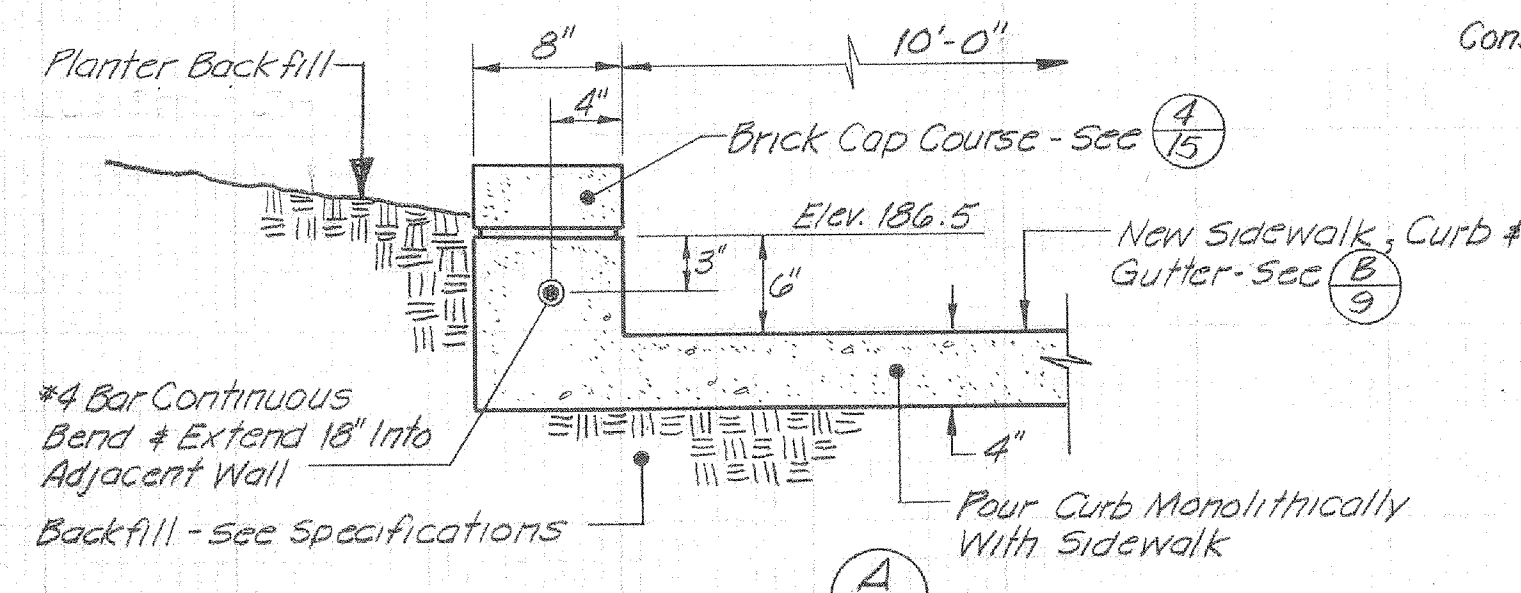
/15) LANDSCAPE CONSTRUCTION PLAN
